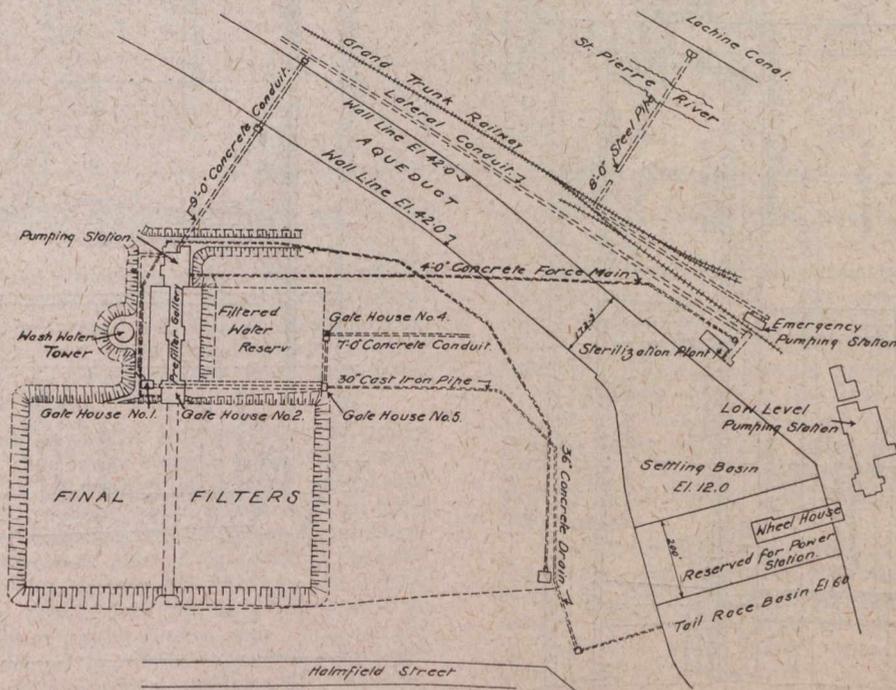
GENERAL PLAN OF FILTRATION WORKS
